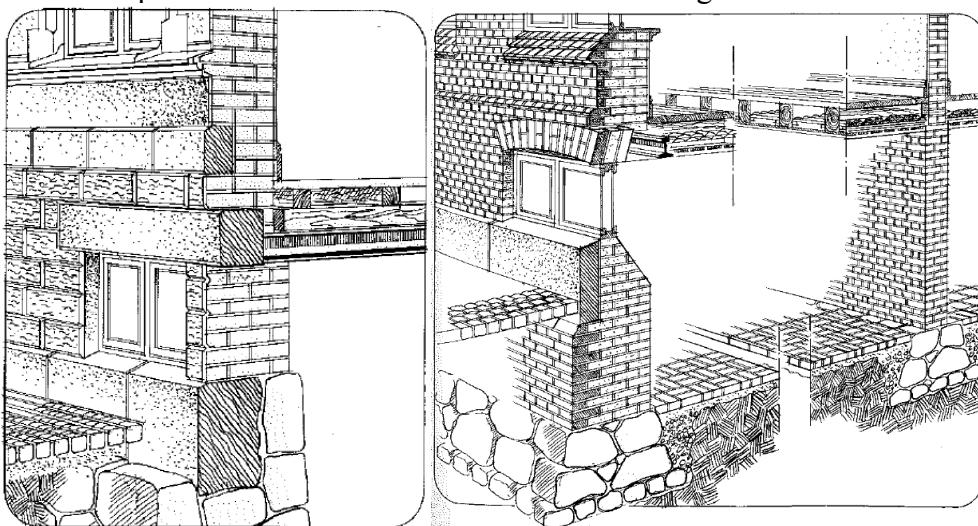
Examples of structural composition of two foundation walls (Björk et al., 2013).
